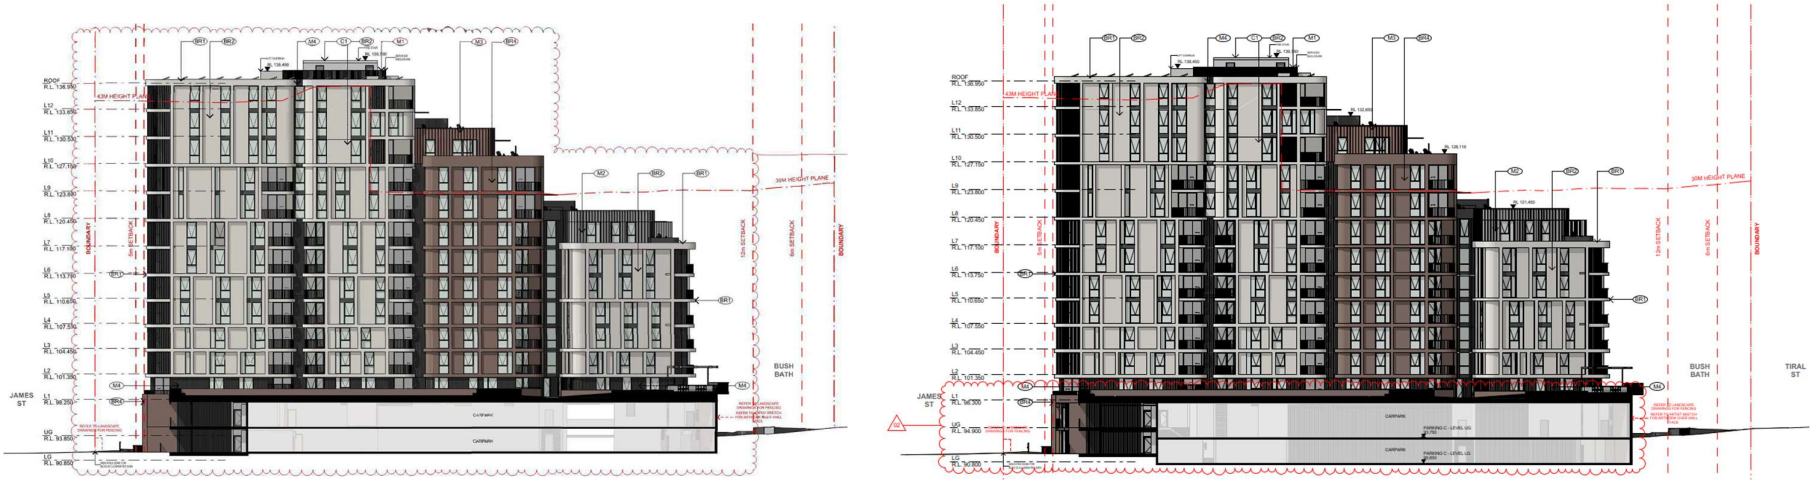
Approved and Proposed West Elevation of Building C (2 of 2)
